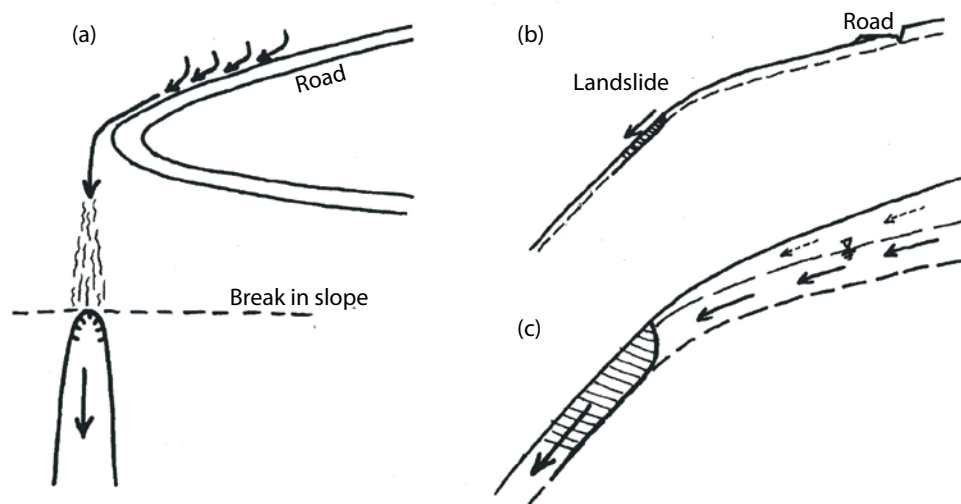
Sketch showing the typical role of a road drainage diversion in triggering a "gentle-over-steep" landslide: (a) Plan view, landslide below a switchback; (b) cross-section showing typical point of landslide initiation; and (c) enlargement, showing convergence of groundwater caused by the thinning soil depth at break in slope. Often, landslides initiate in a concavity on the contour where horizontal convergence of flow also occurs (Jordan 2001a).
